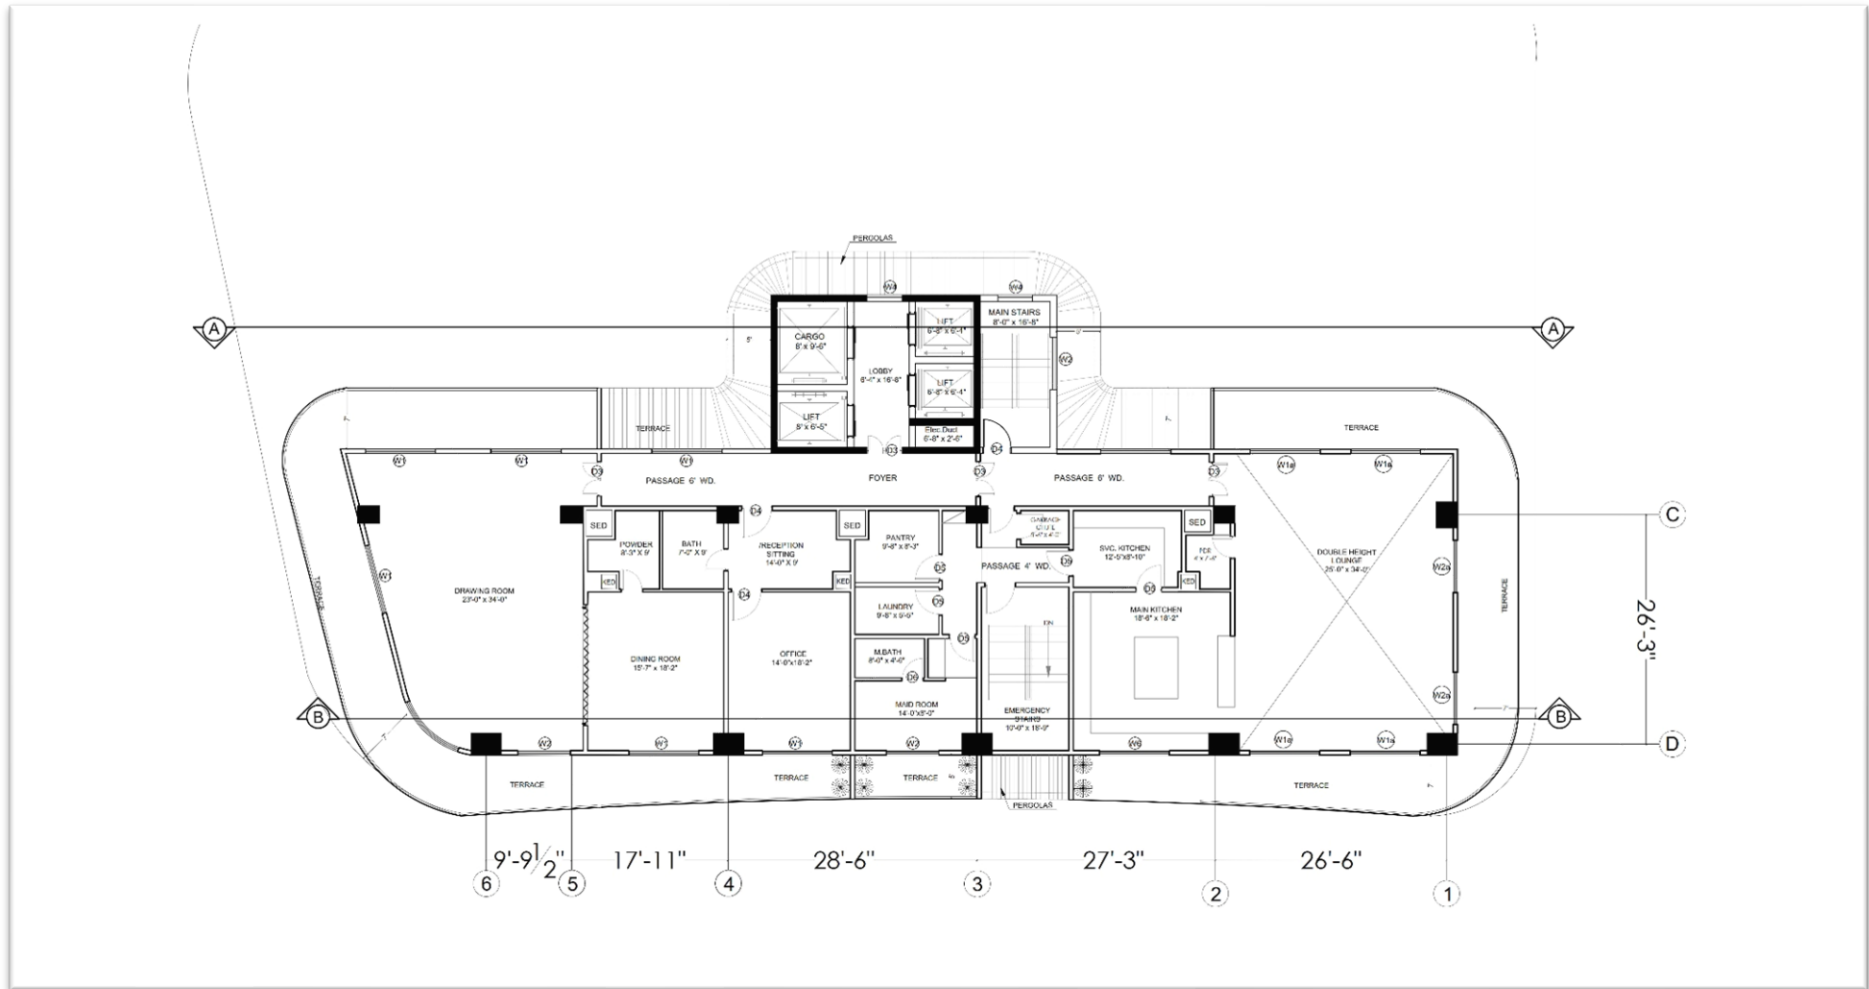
18th Floor Plan of One Hills Apartments Tower III Project
